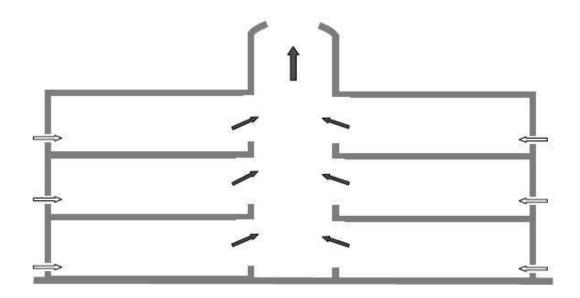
Upward flow induced by an atrium to provide cross-flow ventilation, single-cell building (Etheridge, Natural Ventilation of Buildings 2010)
